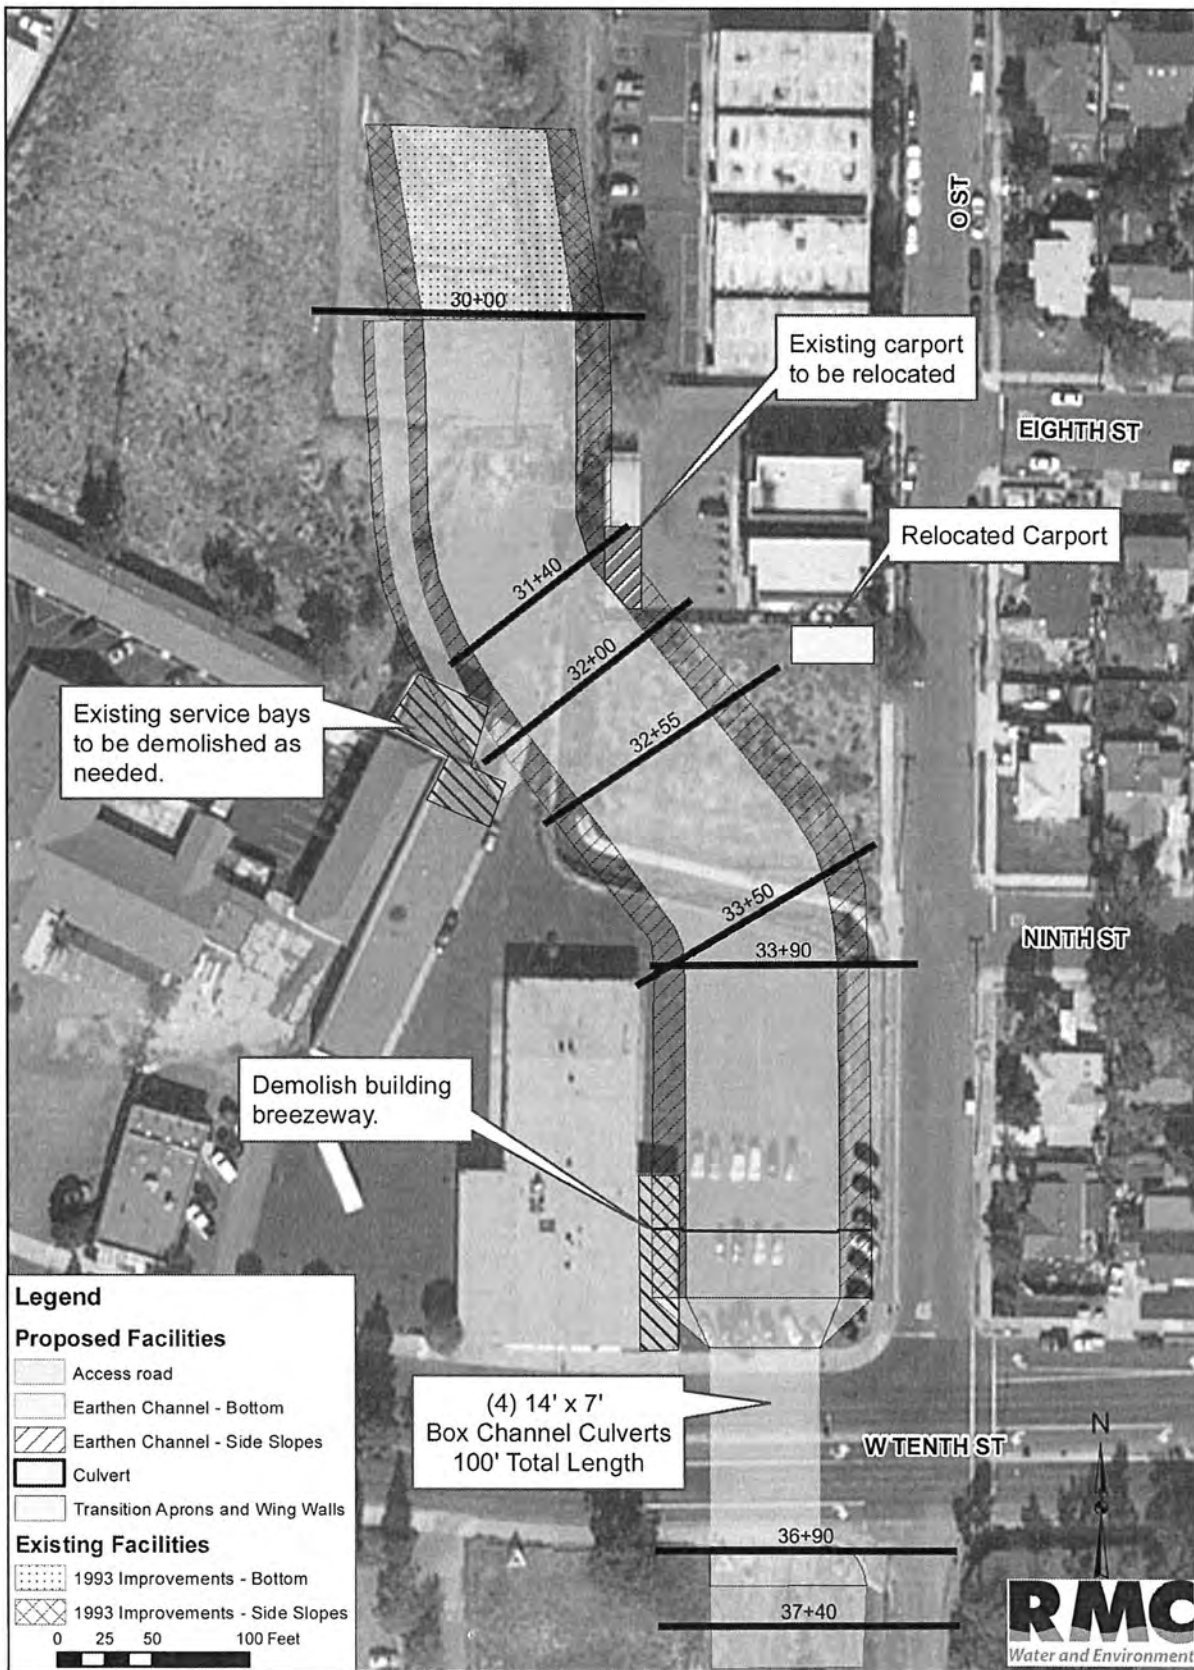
F. Alternative 3A: Revised Alternative Minimum Culvert Option
